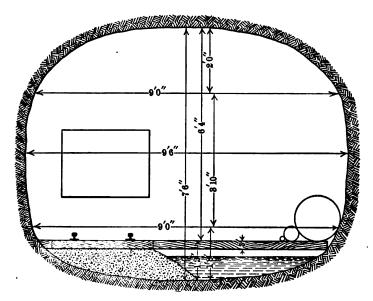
Cross-Section of the Laramie River Tunnel, Showing Position of Tracks, Drain, Ventilating, Compressed-Air and Water-Pipes.
